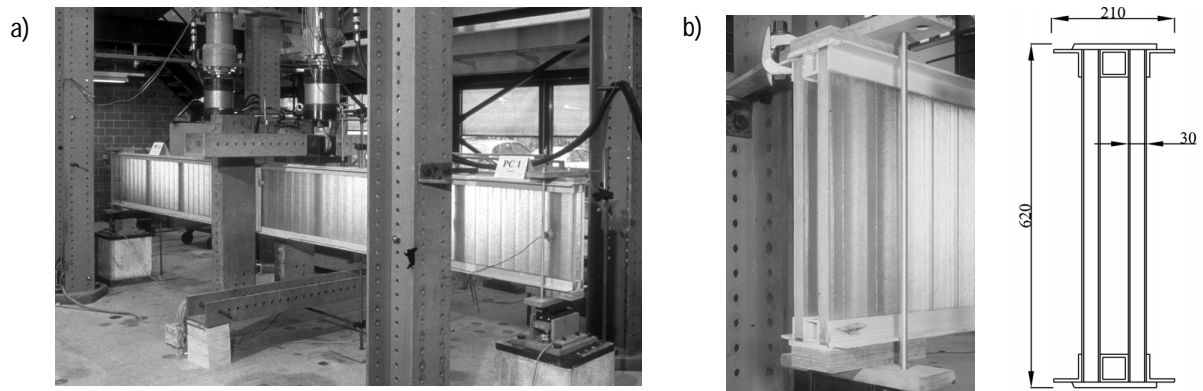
Translucent sandwich girder (a) experimental set-up, (b) cross-section (CCLab)
